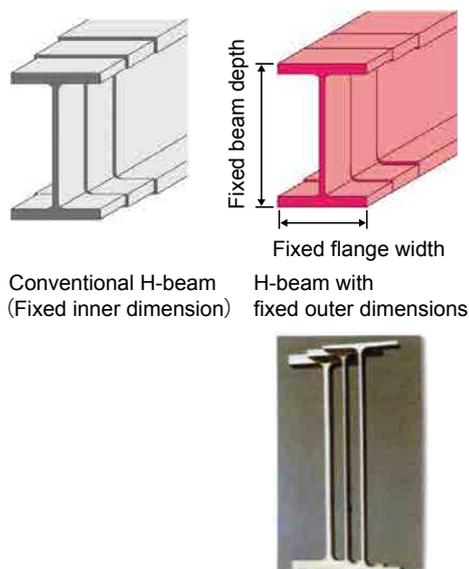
Optimal Structural Design and Construction Cost Savings Attained by the Use of H-beam with Fixed Outer Dimensions
